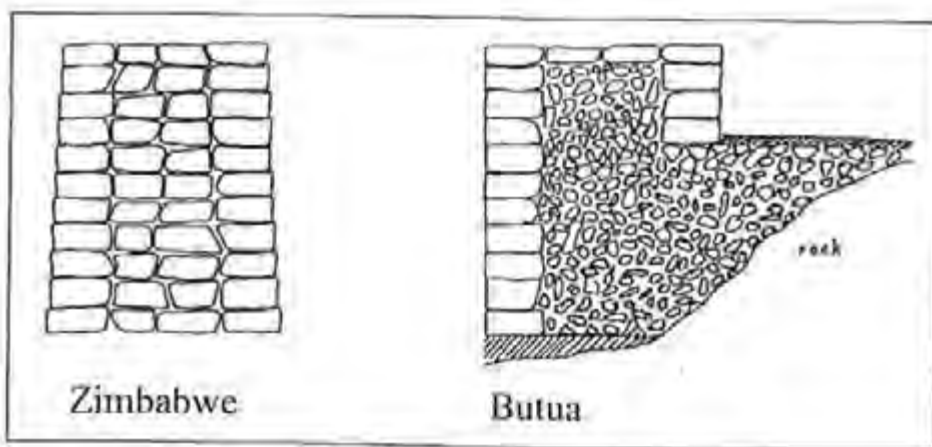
The construction technique of Zimbabwe type freestanding walls, and Khami style terracing (Van Waarden, 2012:74)
